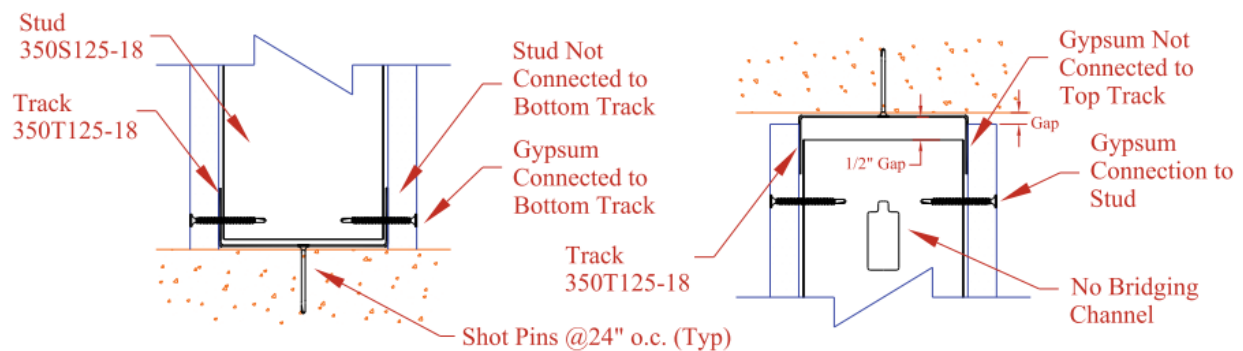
Typical framing and sheathing basic connection (Davies et al., 2011)
